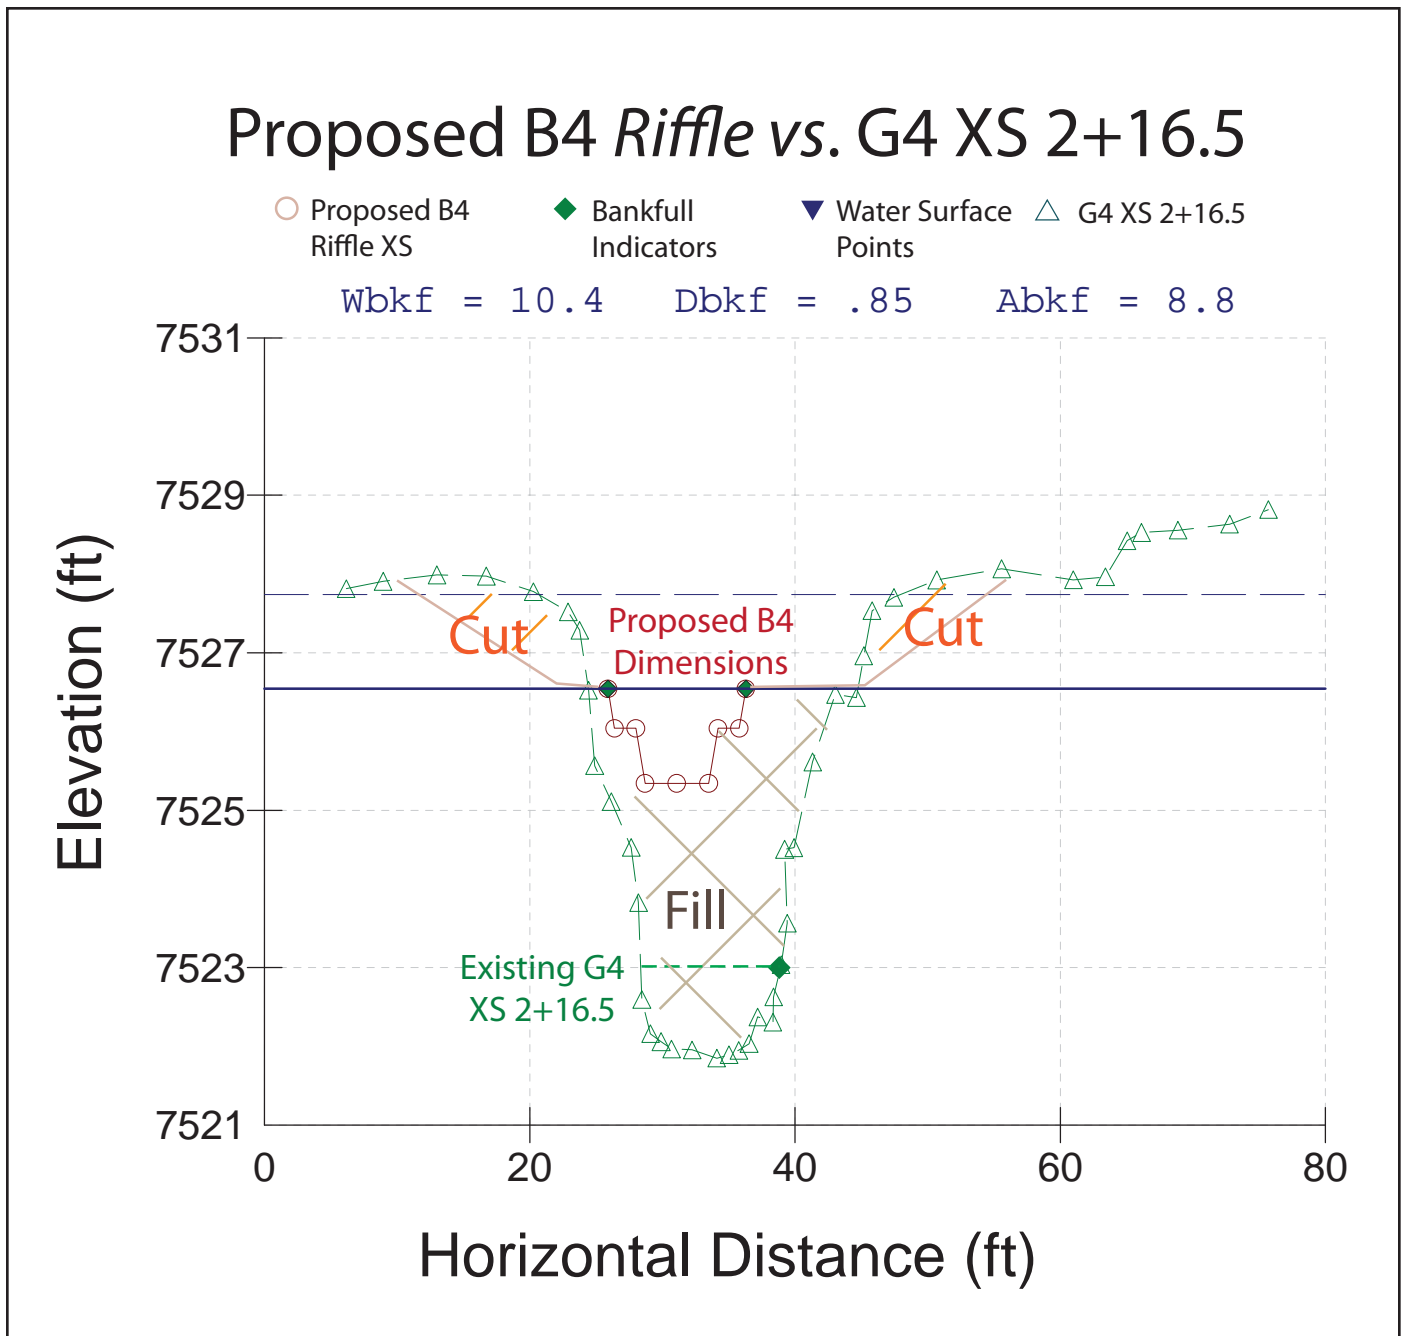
The proposed B4 *riffle* cross-section compared to the existing G4 cross-section 2+16.5, indicating the cut and fill requirements and new bankfull elevation.
